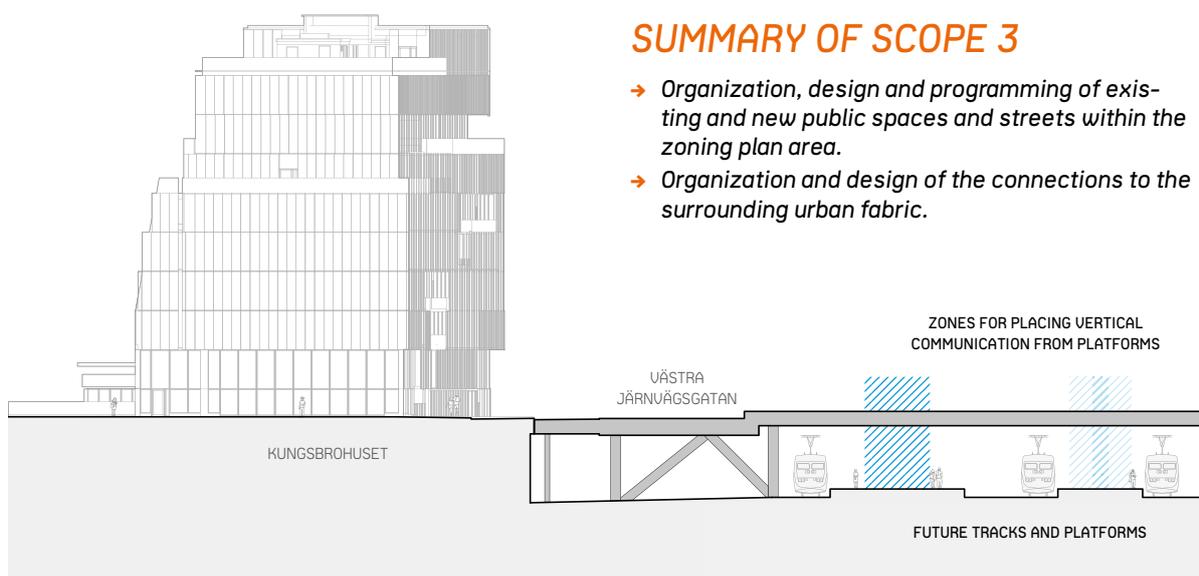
Cross section of Västra Järnvägsgatan facing north, the future decking, new tracks and platforms
